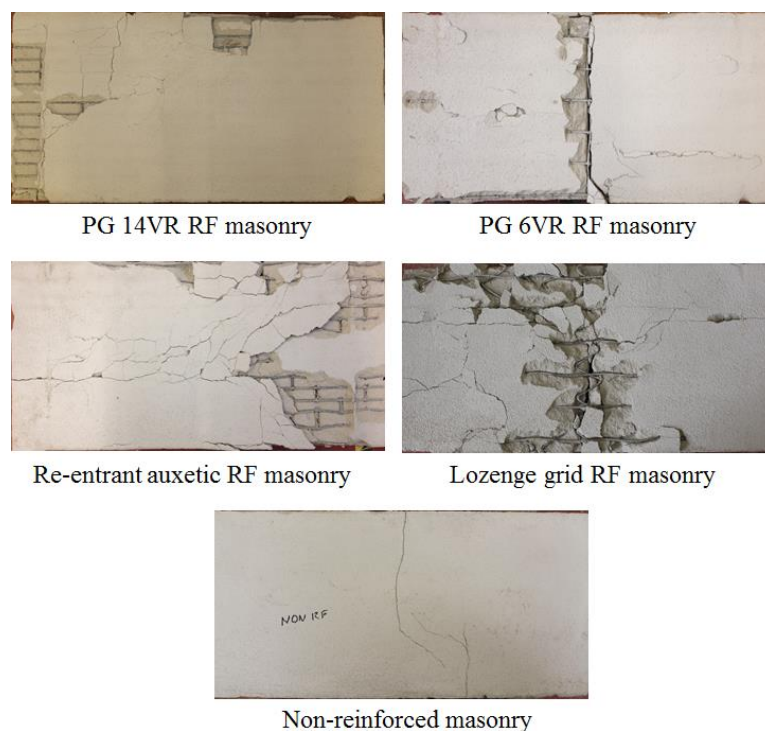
Damage observation of masonry specimens after flexural loading.
